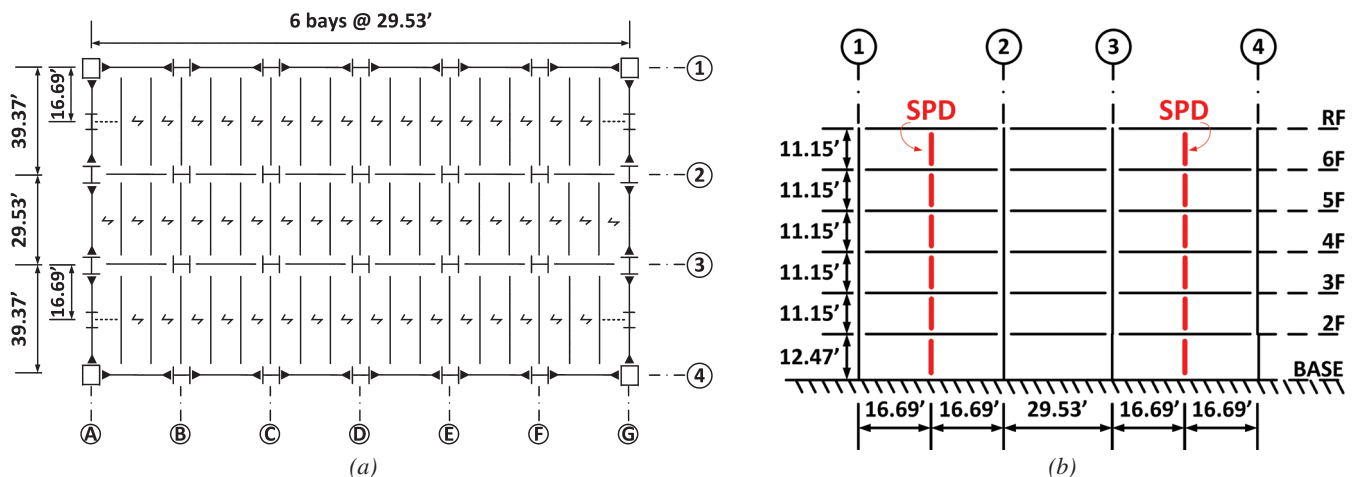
(a) Floor framing plan; (b) transverse frame elevation.
